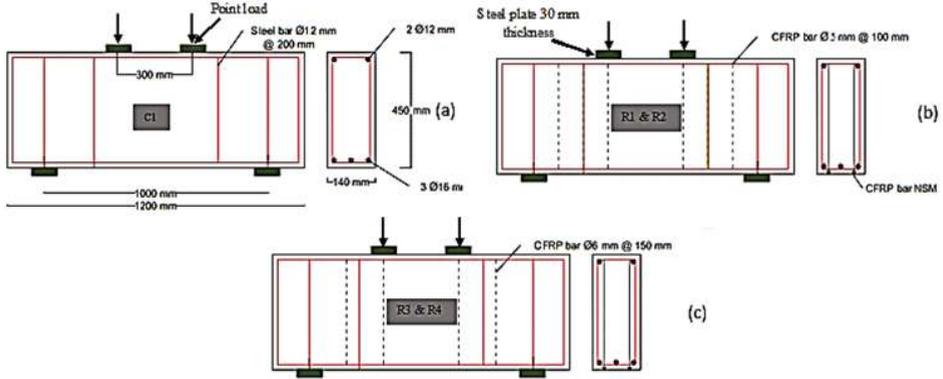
(a) Control beam C1 (b) Beam specimens R1 and R2 with CFRP anchor bars at 100mm c/c (c) Beam specimens R3 and R4 with CFRP anchor bars at 150 mm c/c.
